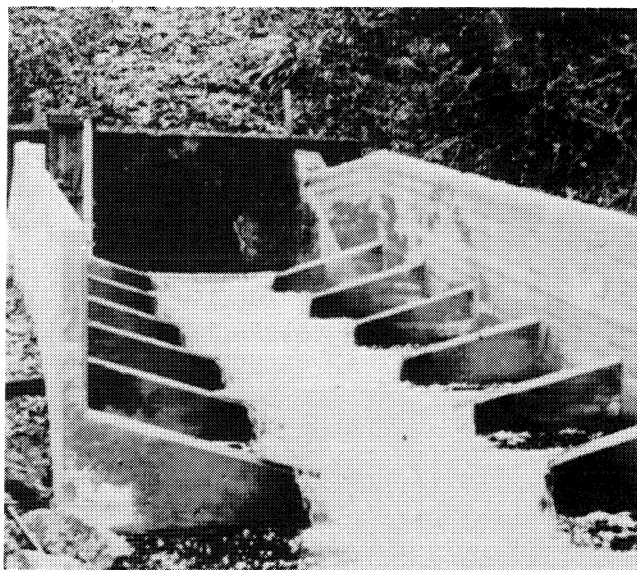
Modified pool and weir fishway provides access through a culvert on Harvey Creek.
